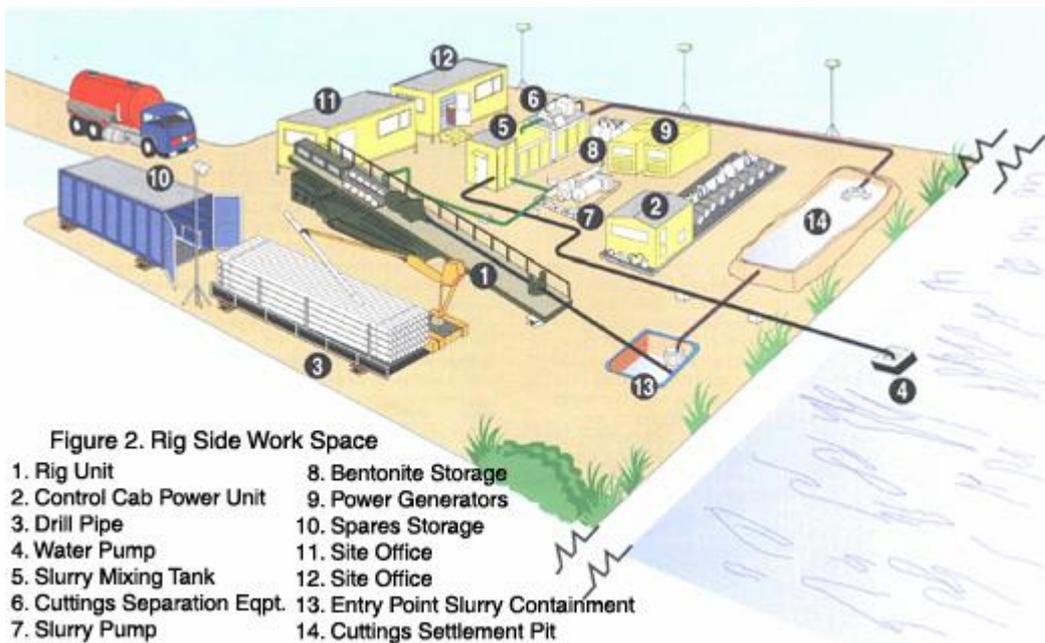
Schematic diagram of Rig Side Work Space
